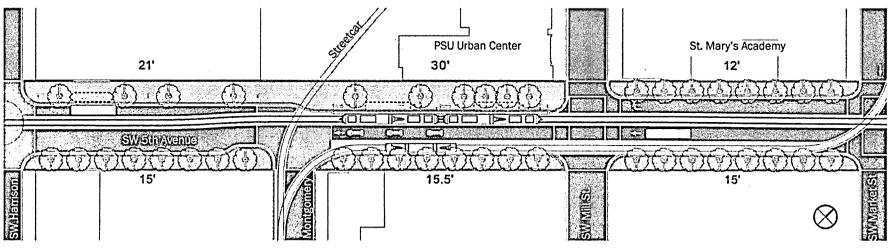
Plan of South Mall Station - 5th Avenue from SW Harrison to Market Street. (X' = sidewalk width)
